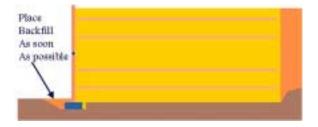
, Place Backfill in Front of the Wall as Soon as Practical
